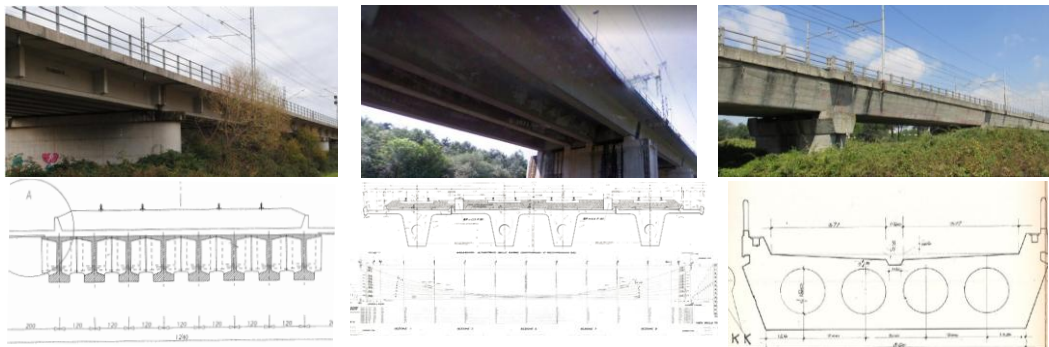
From left to right - bridge 1, bridge 2, bridge 3
